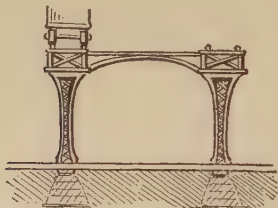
Elevated Railroad, Ninth Avenue, End View.
